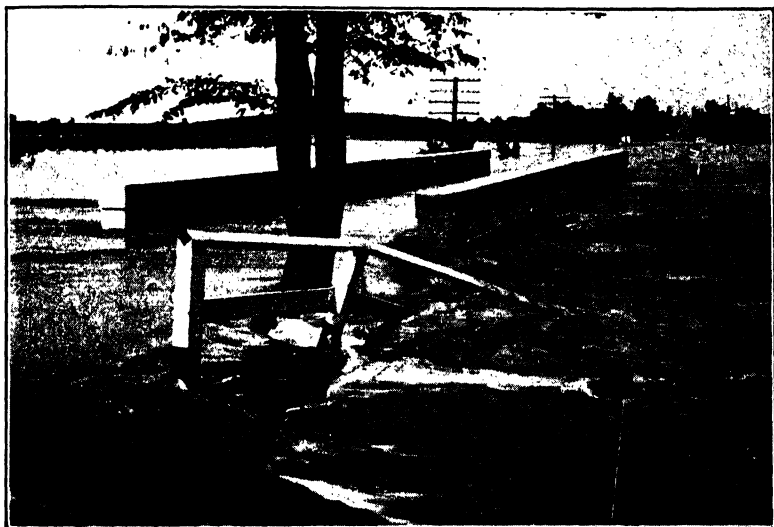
A concrete-girder bridge during an unusual flood.
